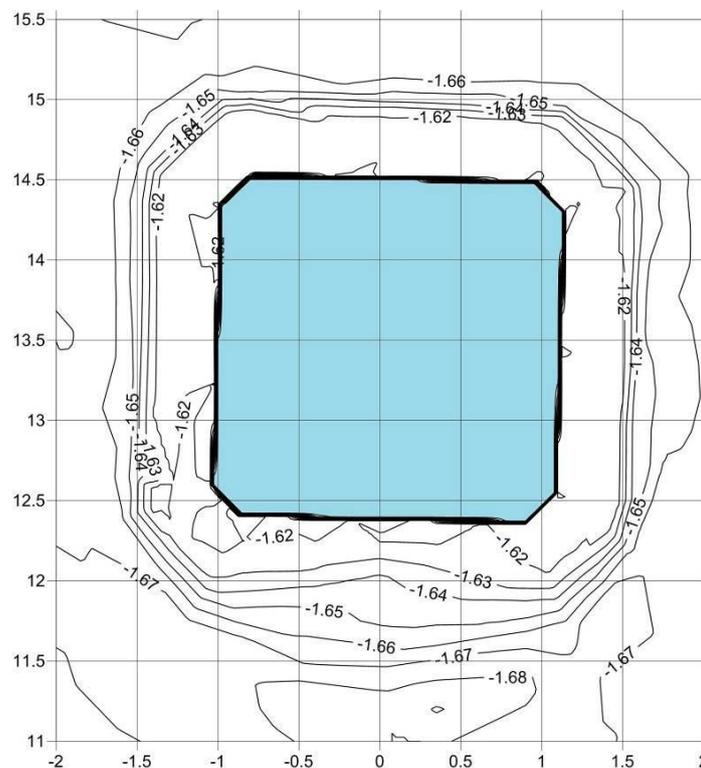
Plan of scour protection levels after execution of tests 1a, 1b, 1c, 2, 3 for wave direction with angle 90° to a plane side of BGT "Prirazlomnaja" (level -1.62 m corresponds to the top level of scour protection before researches)
